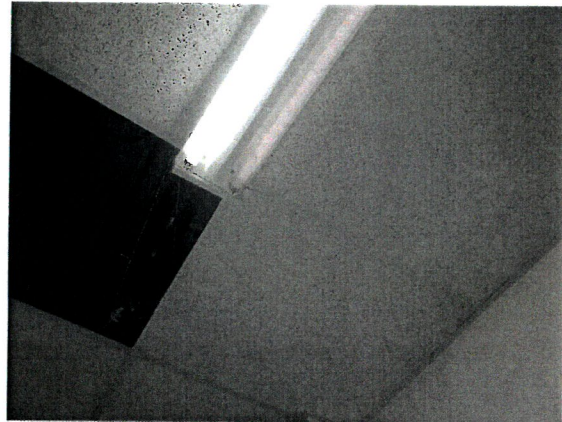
Ceiling Tile – Throughout Main Floor (ND)
